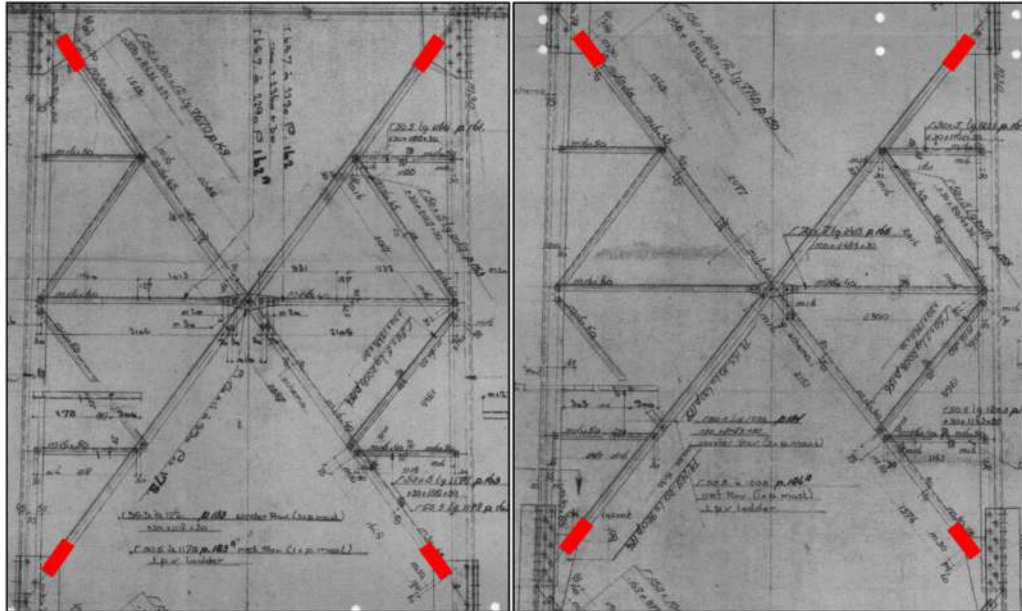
Joints requiring strengthening on P149 (left) and P150 (right)
